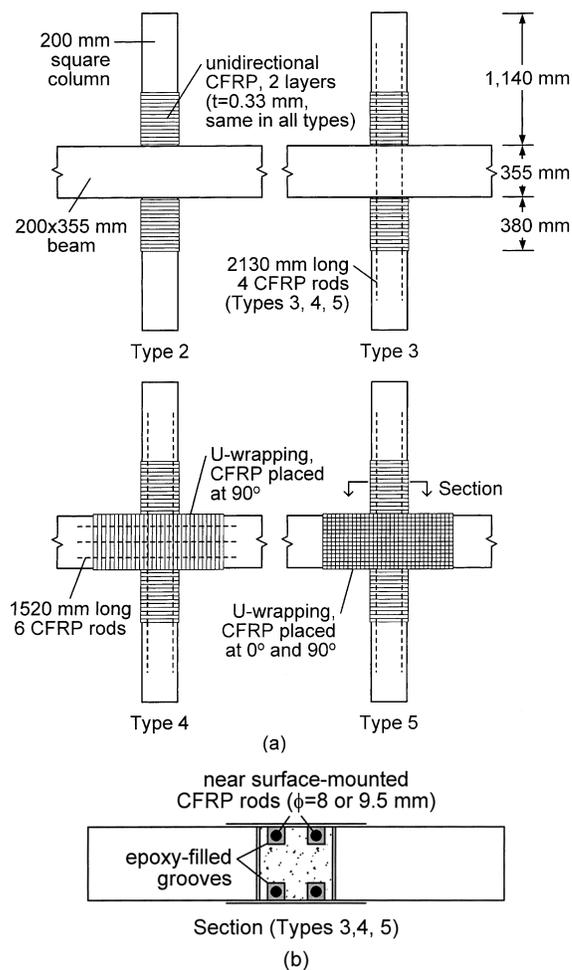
Specimens strengthened with CFRP sheets and/or rods, tested by Prota et al.^{35,36} (a) elevation, and (b) plan.
